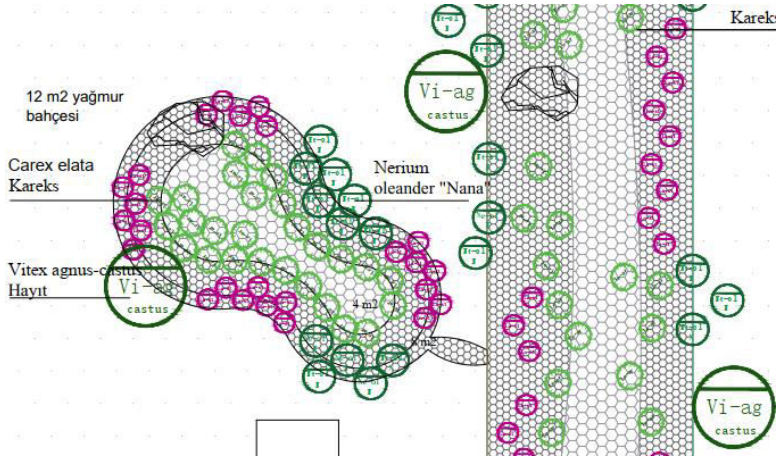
Partial Site Plan showing the rain garden and its connection to the bioswale by IMWRRIC
